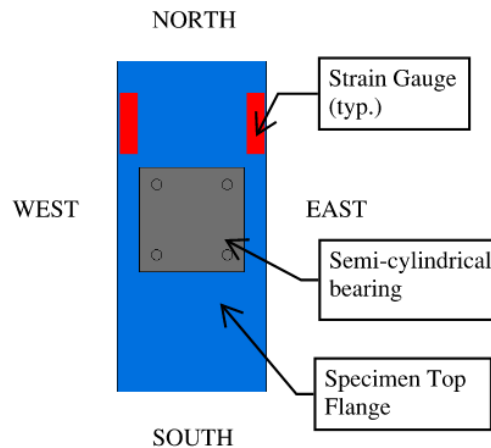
Strain gauges on top flange of back span (strain gauges shown in red)
